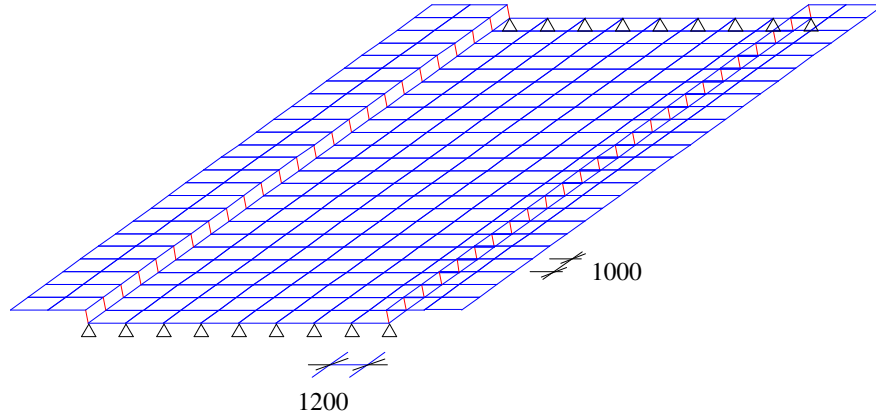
Upstand FEA of Single Span Bridge Deck with Wide Edge Cantilevers
